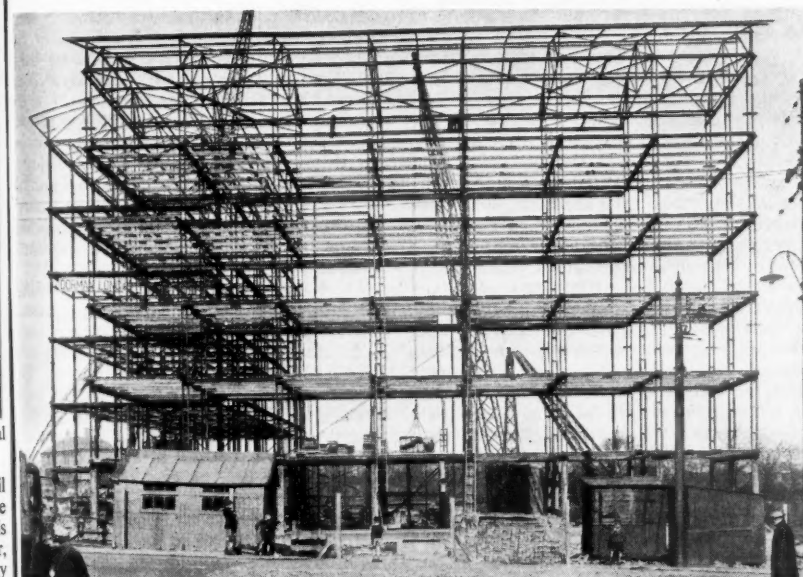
Hindhaugh Street Flats, Newcastle upon Tyne. Designed by E. Czeiler as a three-dimensional frame, the floors acting as horizontal girders for lateral stiffness
